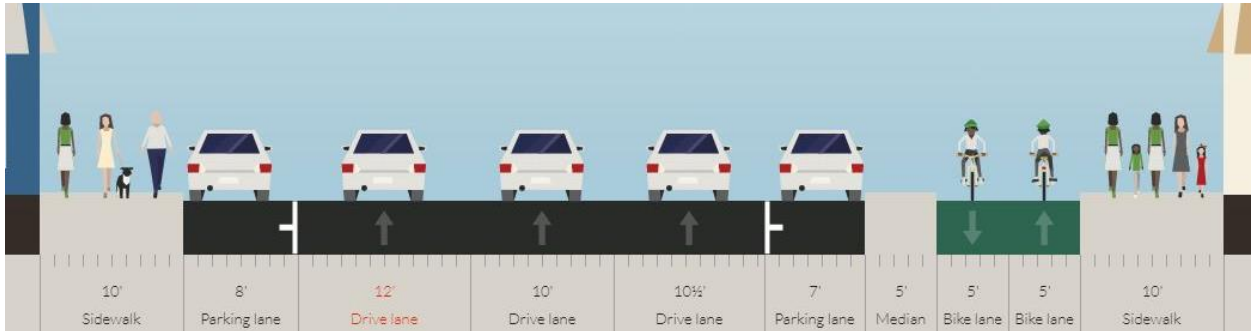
Typical Cross Section of Folsom Street between Mabini and 2nd streets, looking east
